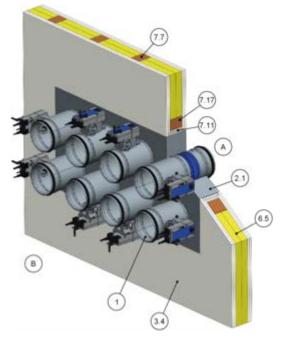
Mortar-based installation in lightweight partition wall with timber stud – Multiple occupancy of an installation opening
